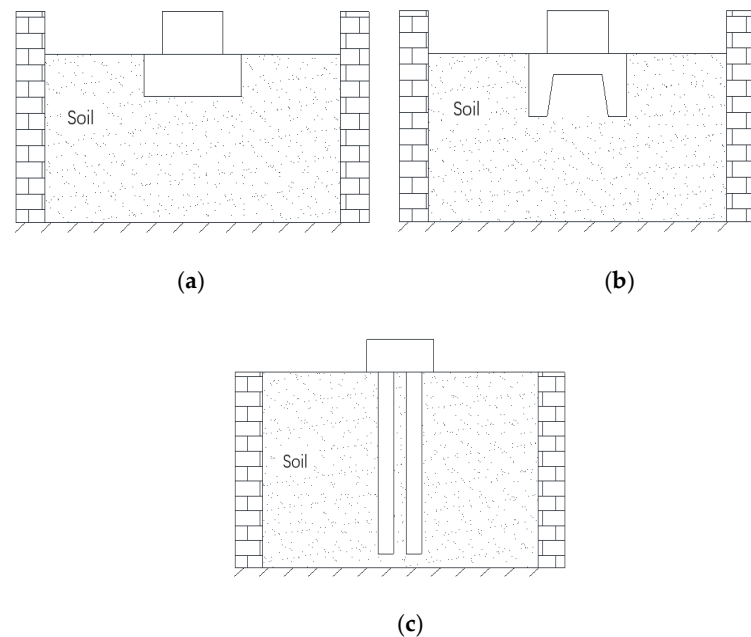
Cross-sectional views of the sand tank configurations in the laboratory: (a) spread foundation; (b) caisson foundation; (c) grouped pile foundation.
